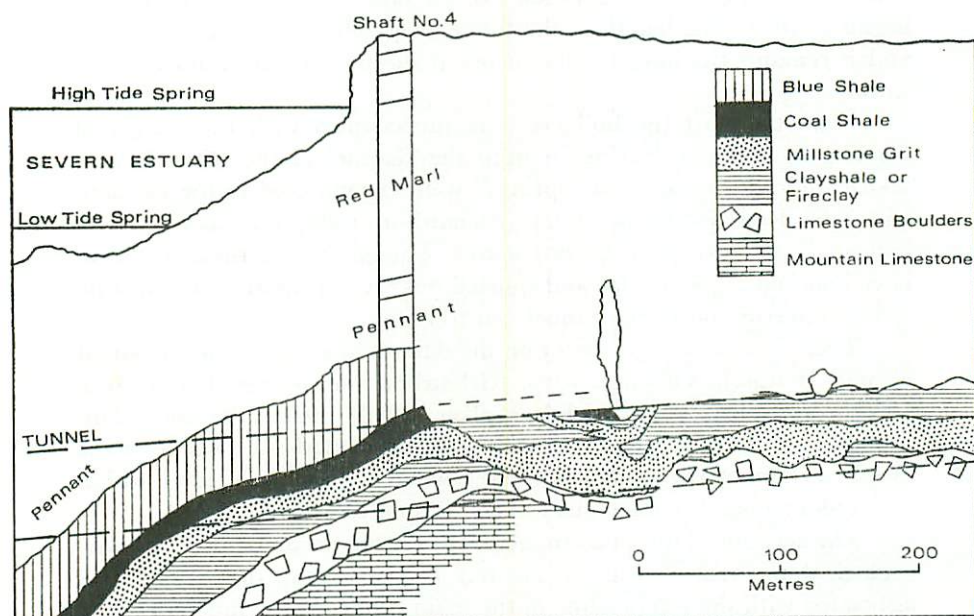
Geological section of the Severn Tunnel in the area of the two major cavities—Welsh side, looking down stream. (After C. Lloyd Morgan, 1888).
